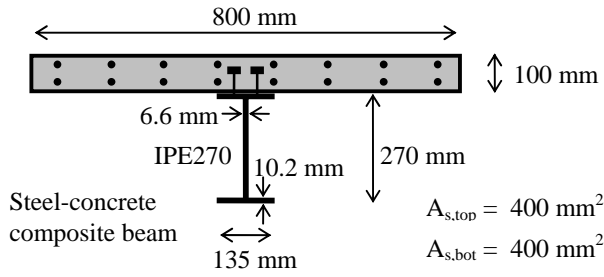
Composite beam cross-section definition of the tested SCC frame structure analyzed
